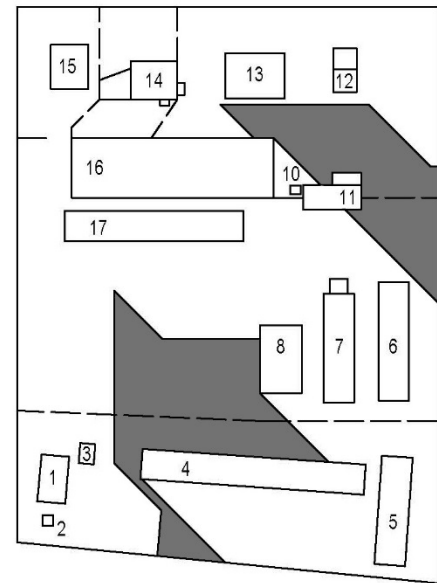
Site plan showing areas open to breezes from the north-west (coloured grey).
